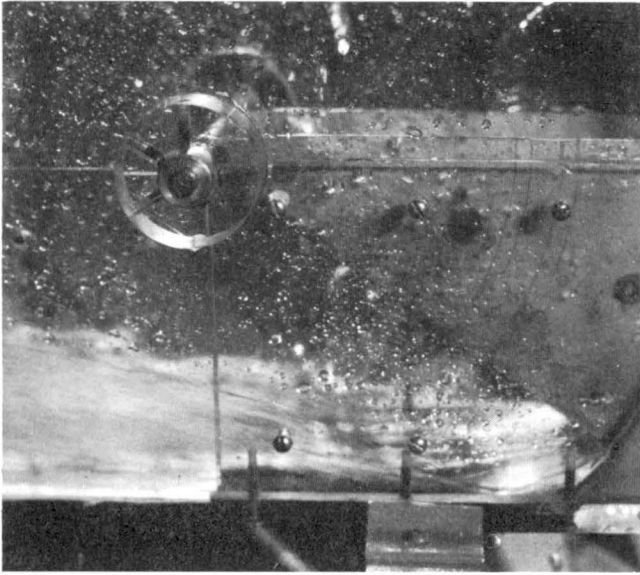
1:70-scale model with a 16-in. wall offset for 4-ft gate opening and 415-ft head.
